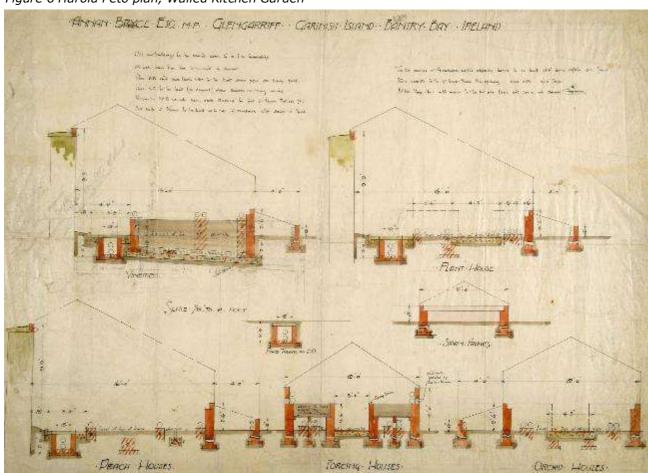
Harold Peto sections, Walled Kitchen Garden growing houses.
